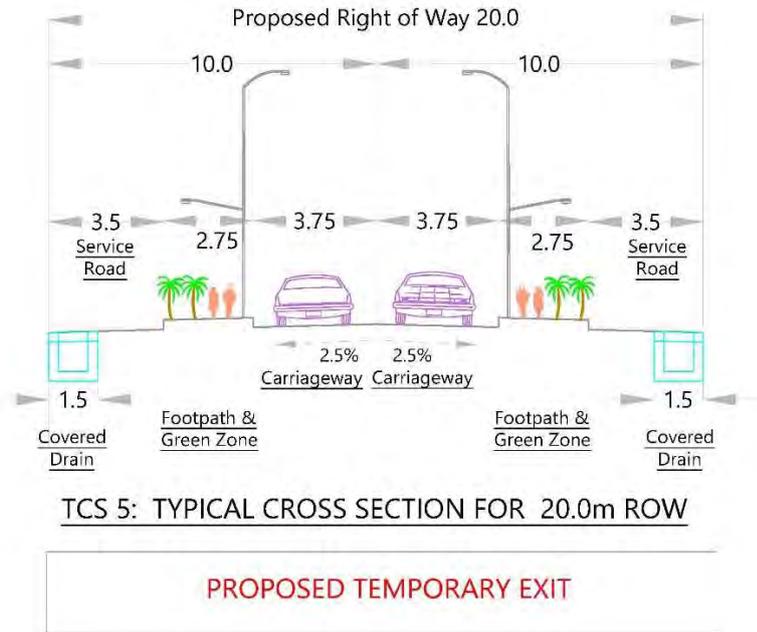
2 Lane Section for Temporary Exit from Existing Terminal 20 m PROW
